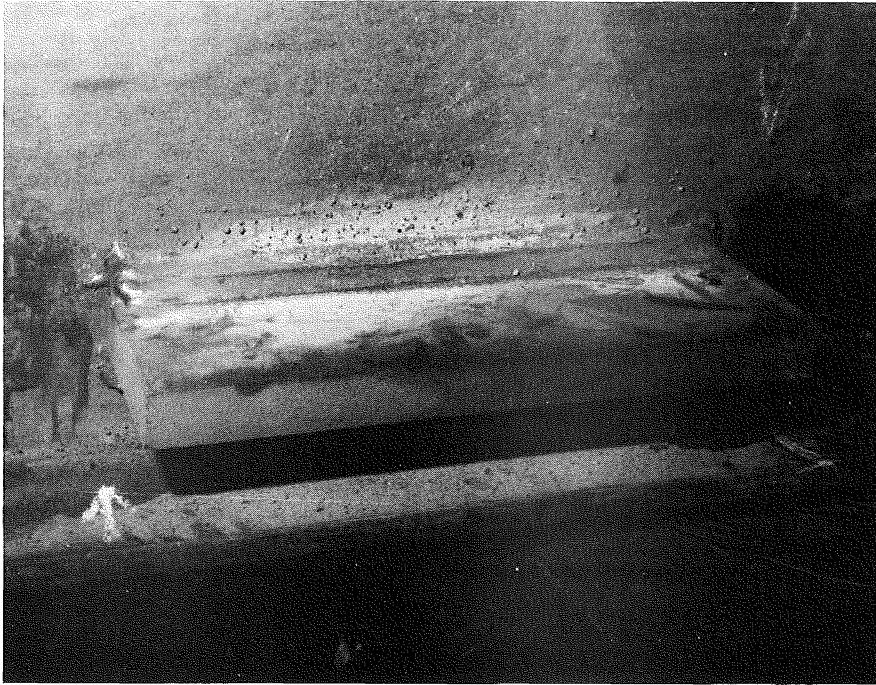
Gusset Plate Fillet Welded to Web
